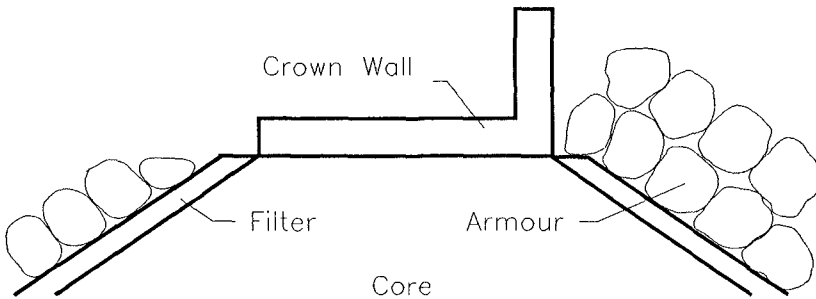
Placement of Armour Stone Adjacent to Crown Wall
